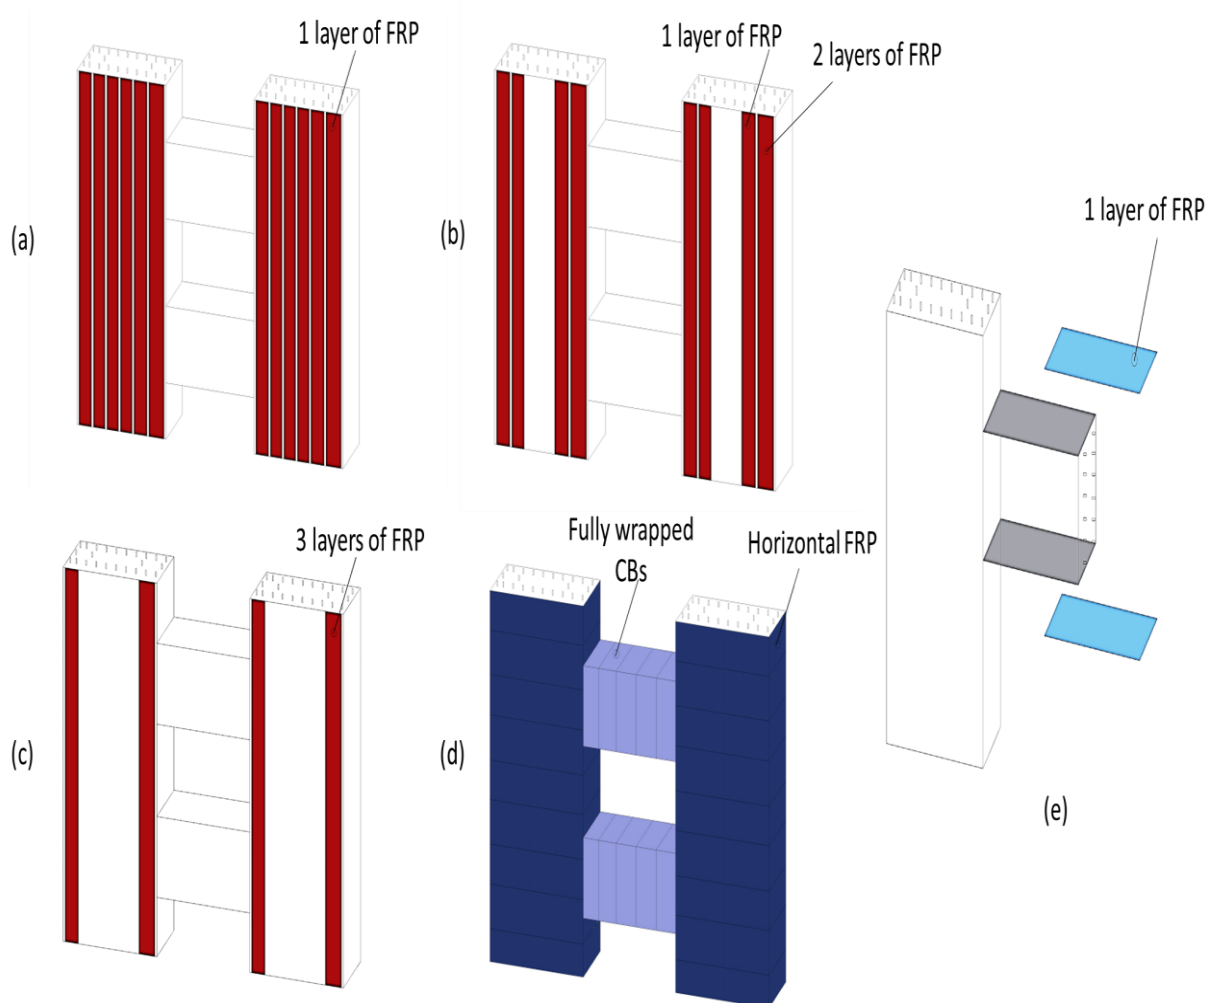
Strengthening schemes: (a) wall piers in S1-CSW; (b) wall piers in S2-CSW; (c) wall piers in S3-CSW; (d) FRP wrapping of wall piers and coupling beams in all schemes; and (e) coupling beams’ flexural strengthening in S3-CSW.
